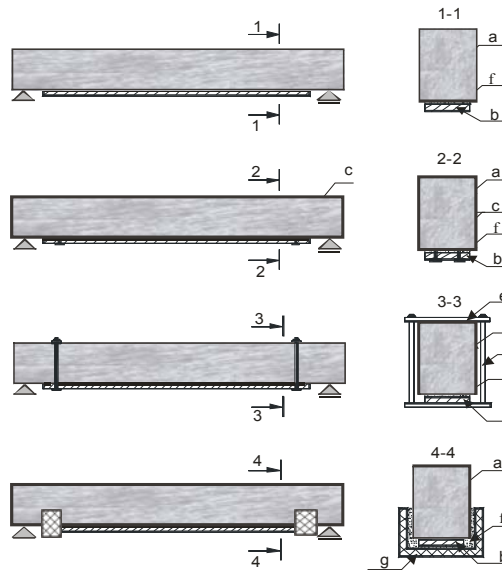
Strengthening of RC beams with FRP soffit plates a- concrete; b-FRP plate; c-anchor bolts; d, e - elements of the metallic jig; f- adhesive layer)
